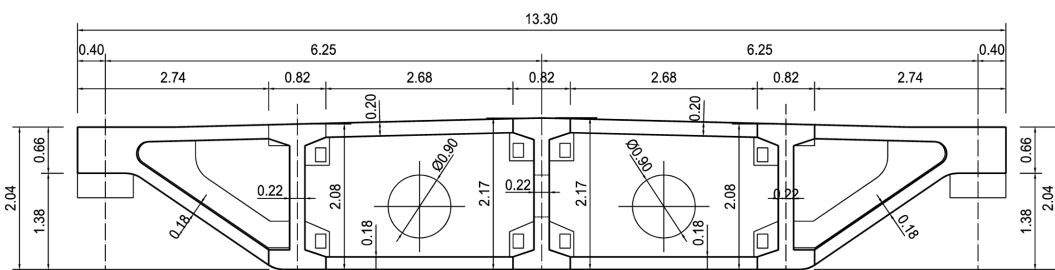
Cross section through the deck of Mila's Cable Stayed Bridge (unit in meter)
